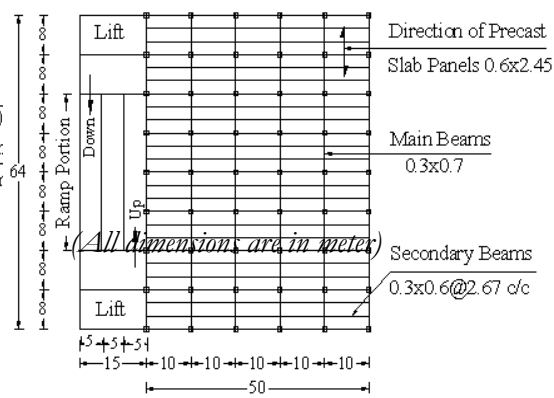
Typical Plan for Precast Frame with Precast Concrete Floor
